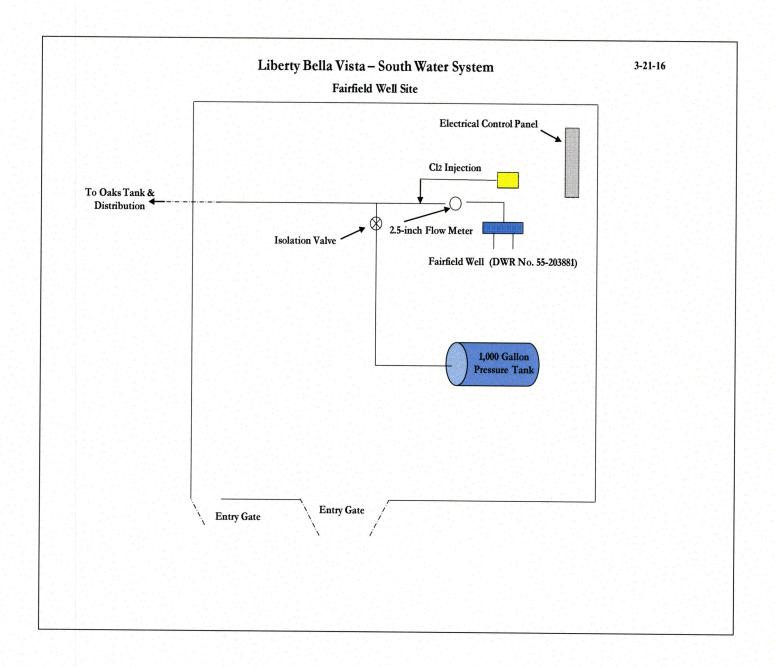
SOUTH WATER SYSTEM FAIRFIELD WELL SITE
